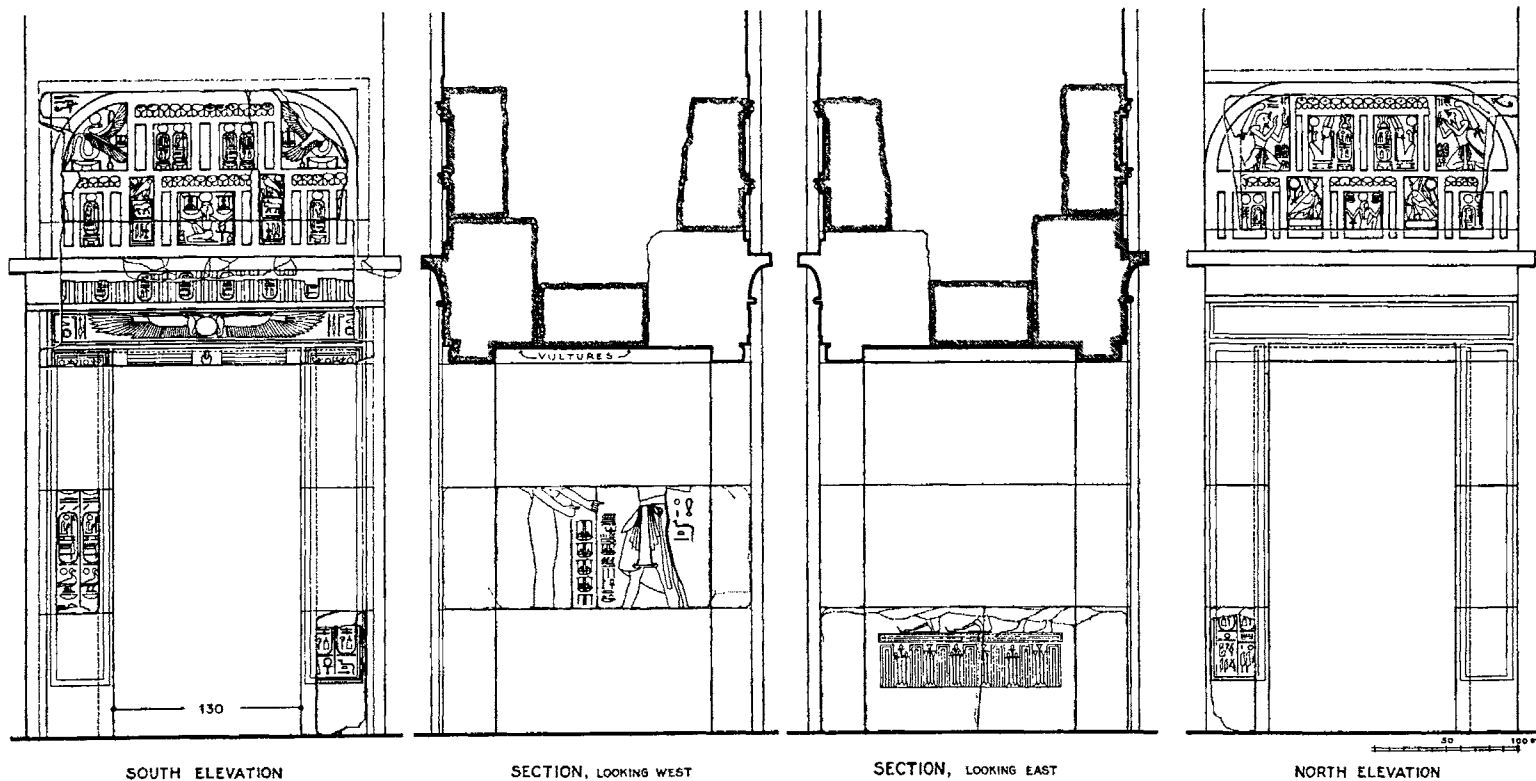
SECTIONS AND ELEVATIONS OF THE DOORWAY BETWEEN THE GREAT COLUMNED HALL AND THE THRONEROOM OF THE FIRST PALACE
